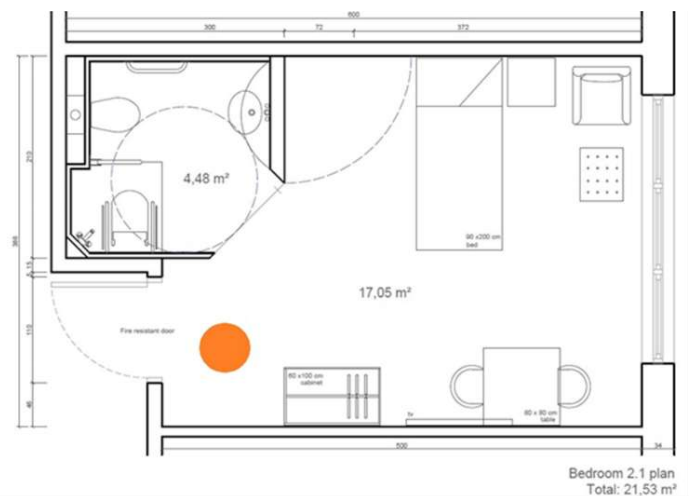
Senior Assist Londerzeel Nursing Home Single Bedroom Plan
